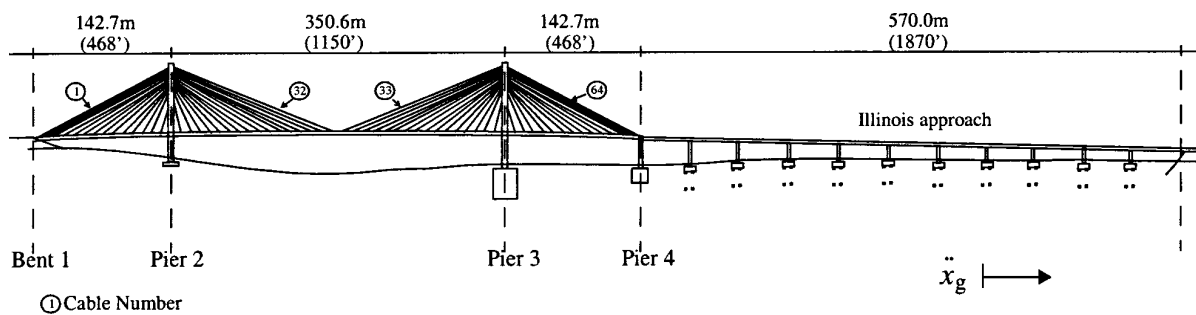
Schematic diagram of the Cape Girardeau Bridge.
